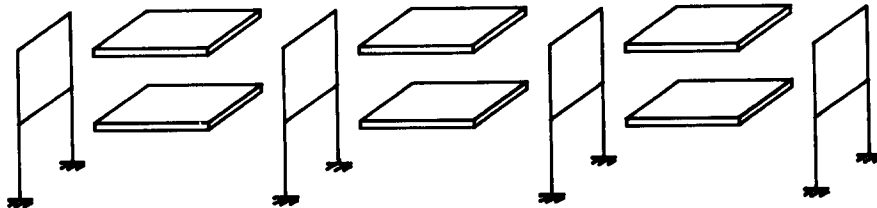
A multistory building structure decomposed to two-dimensional resisting systems and floor systems
